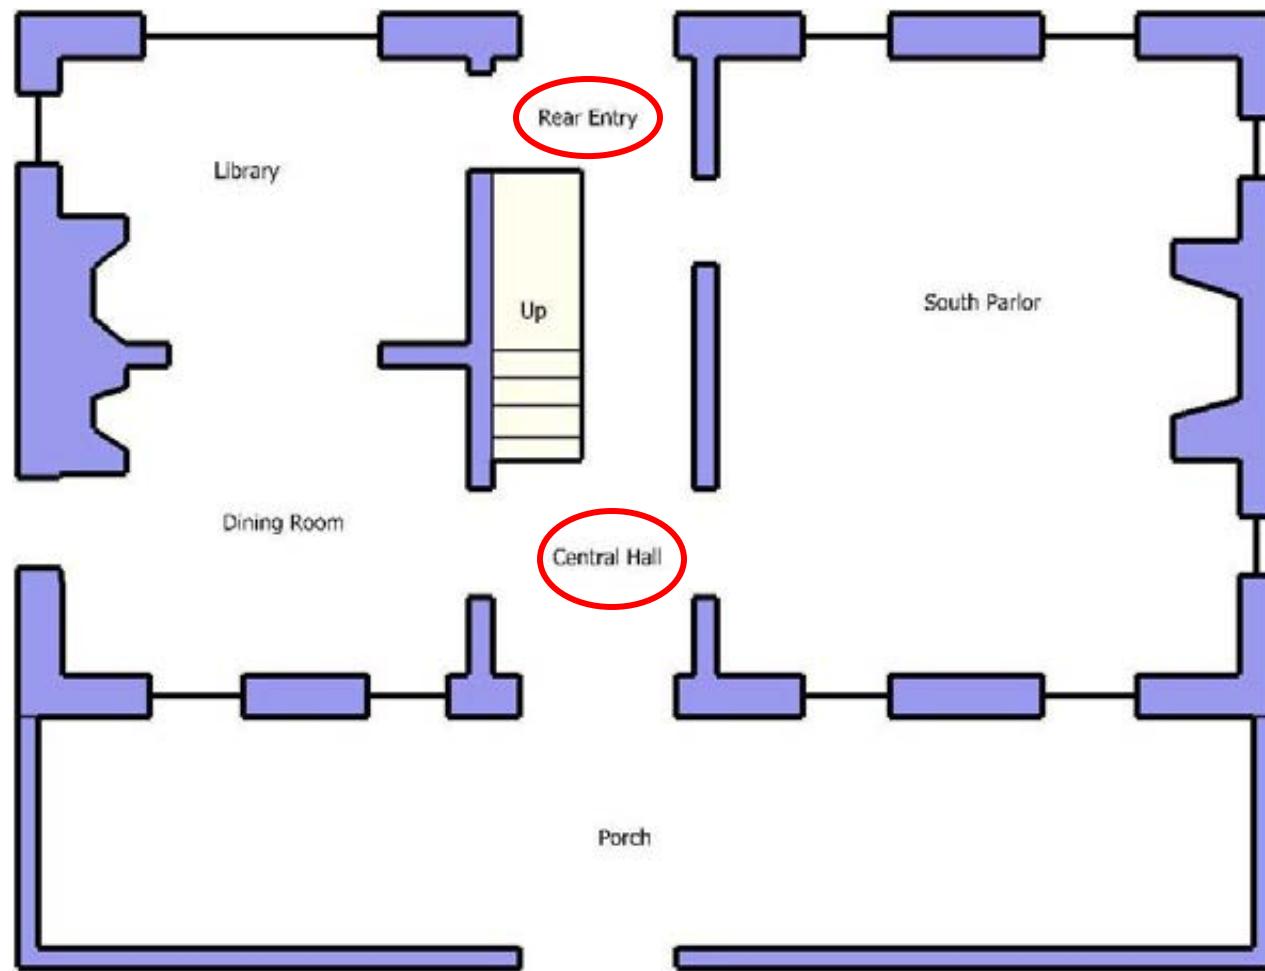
Plan showing the center hall and rear entry on the first floor. Drawing by Kathleen Manicke.
